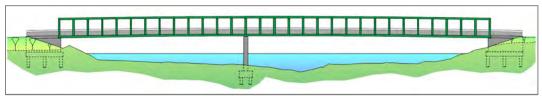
Indicative Elevation of the Black Cart Cycleway Bridge
